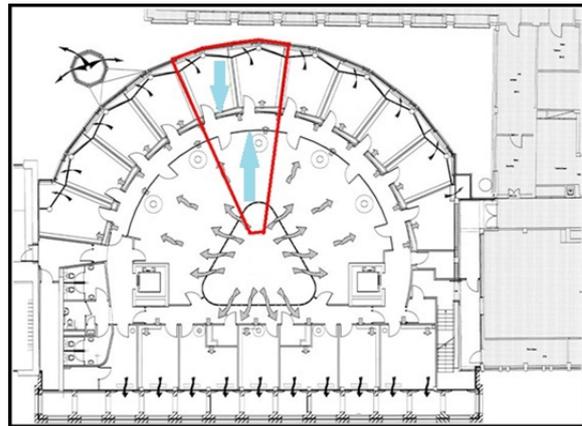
Image shows a plan view of the SSEES building (Short et al. 2009). The resistance pathways are indicated in this image by blue arrows, while the red boundary line depicts the section of the building to be modelled.
